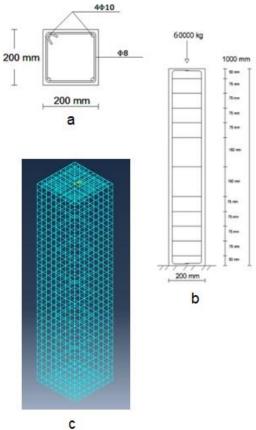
a and b) Schematic of the test system and details of the columns c) Column elementing modeled in Abqus software
